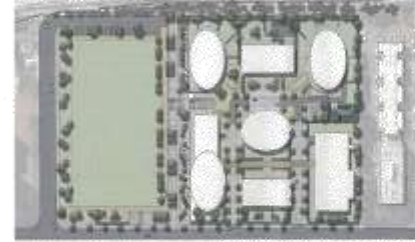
Illustrative view of proposed masterplan showing mixed use development and public open space (source: TRUDR).
